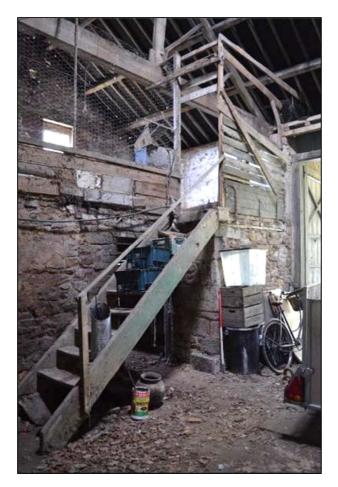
(Shot 55): Interior of barn, general view of two-storey area at southwest corner of barn, stairs leading up to Room 1b, (1m scale)
